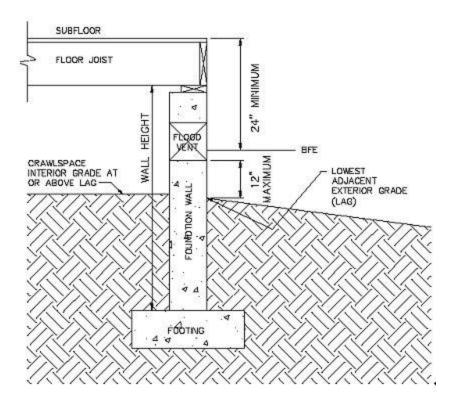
PREFERRED CRAWL SPACE CONSTRUCTION
